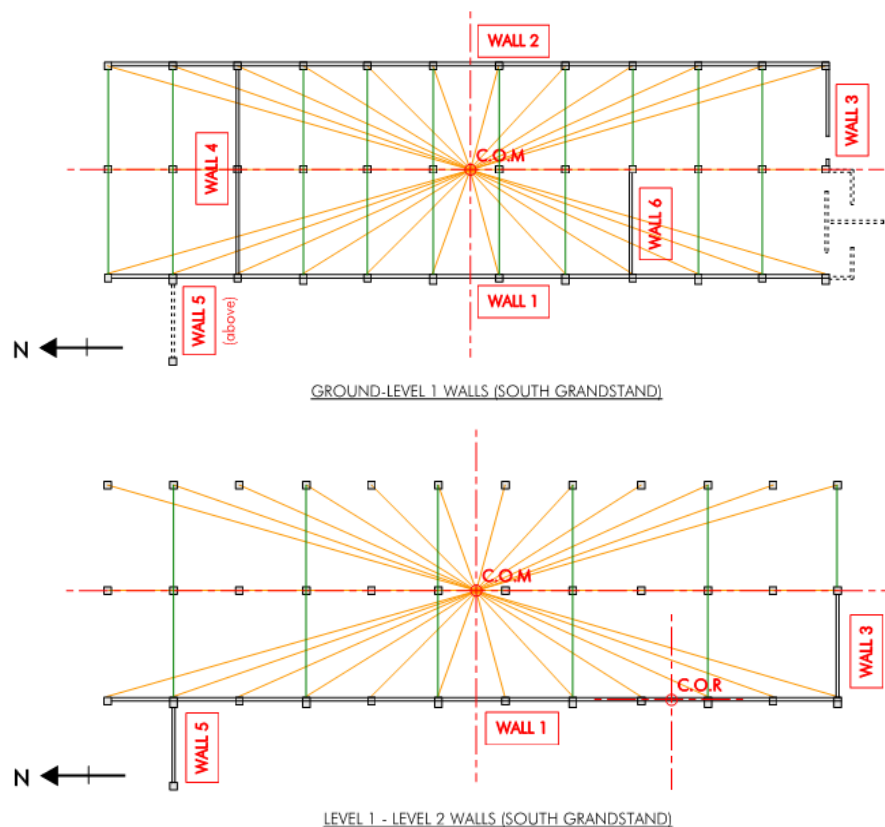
Floor Plans of the Wall Layout for the South Grandstand
